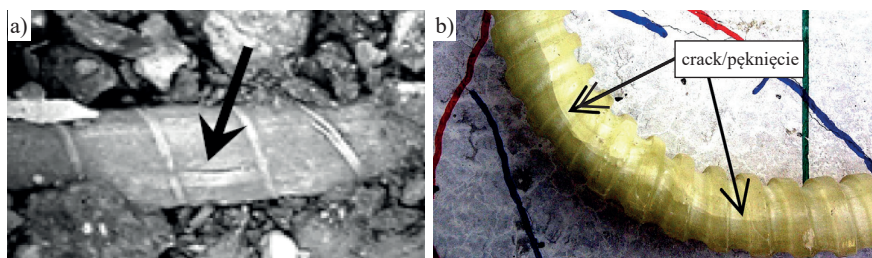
Failure of transverse reinforcement at the corner: a) delamination of bar; b) cracking of stirrup [7, 10]
